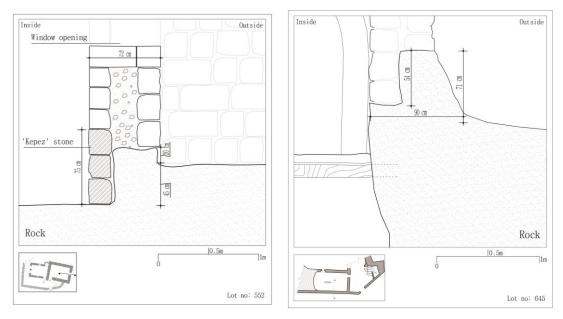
26 Outer row of wall sit lower than inner row - Foundation with rock-cut basement
